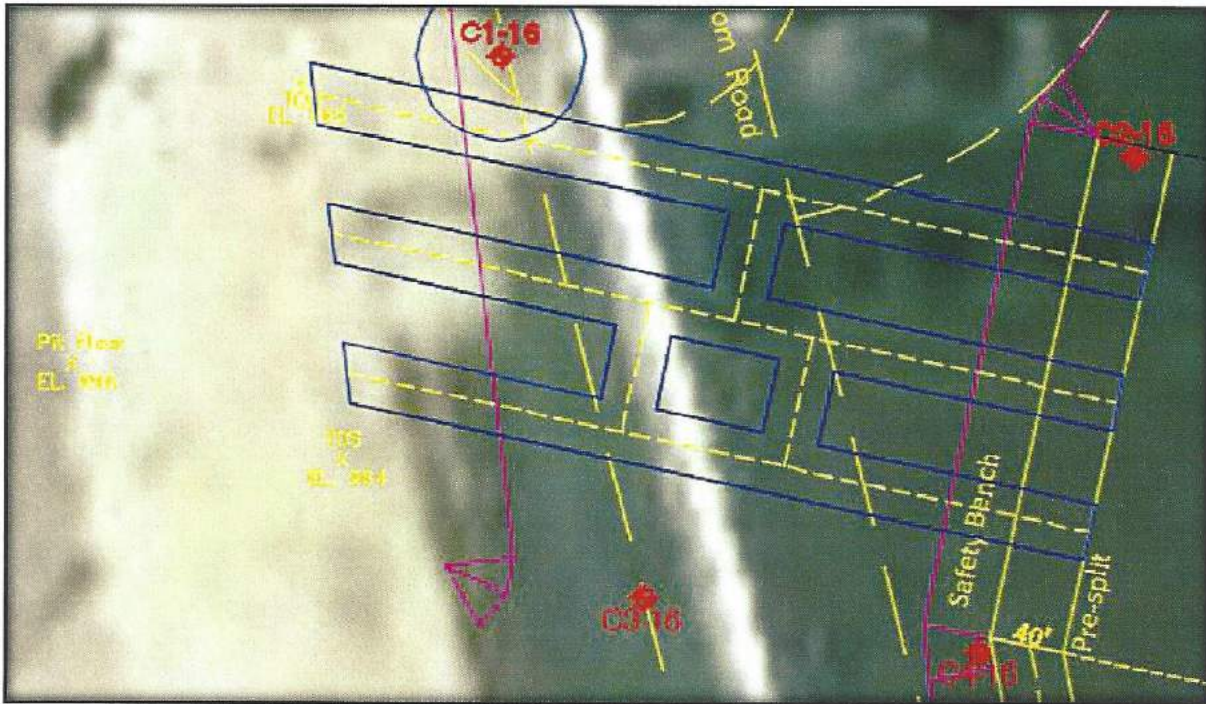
Layout of the Three Tunnels Beneath Jerome Road/County Road 11.
